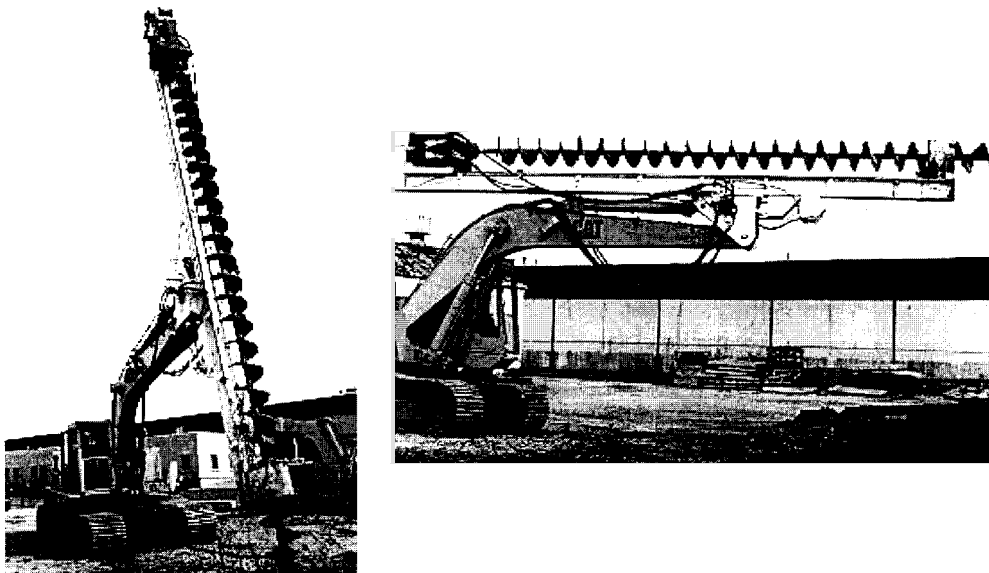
Hydraulic excavator pile driving configuration (Hercules Machinery Corp.).
